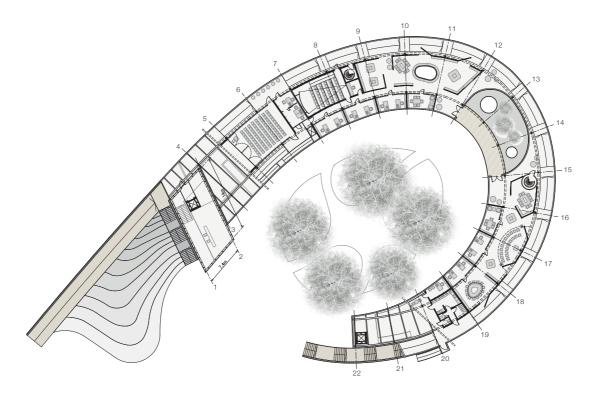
Ground floor plan of the building (Riga: Andis Alksnins, 2015)
